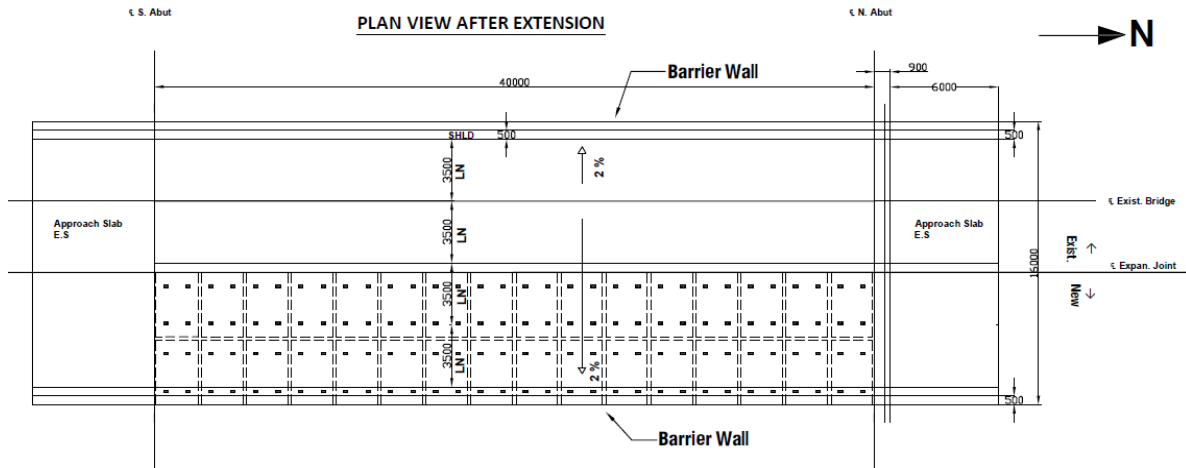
Plan view of the widened bridge (Dimensions are in mm)
